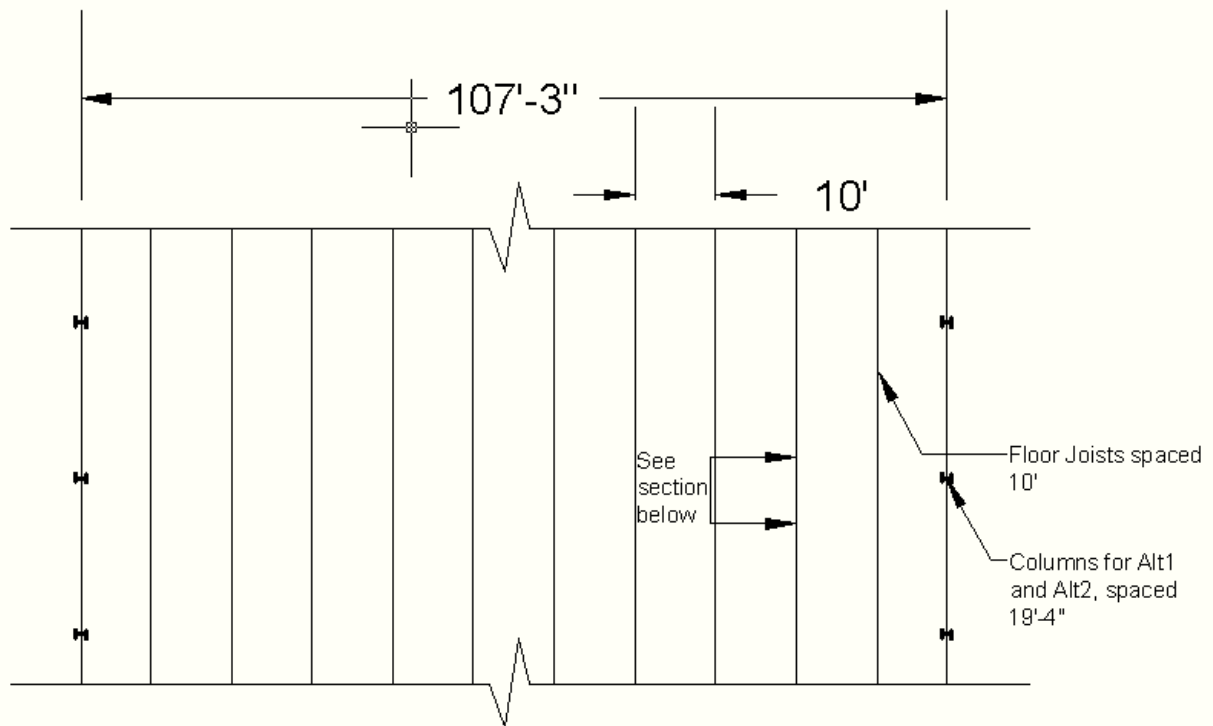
Plan View of Natatorium with Floor Joists and Columns
